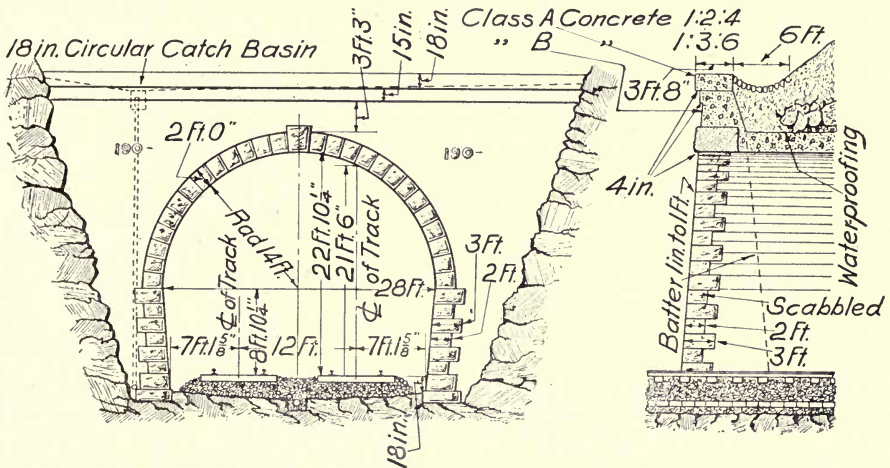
STANDARD DOUBLE-TRACK TUNNEL FACADE, N. Y. C. & H. R. R. R.
